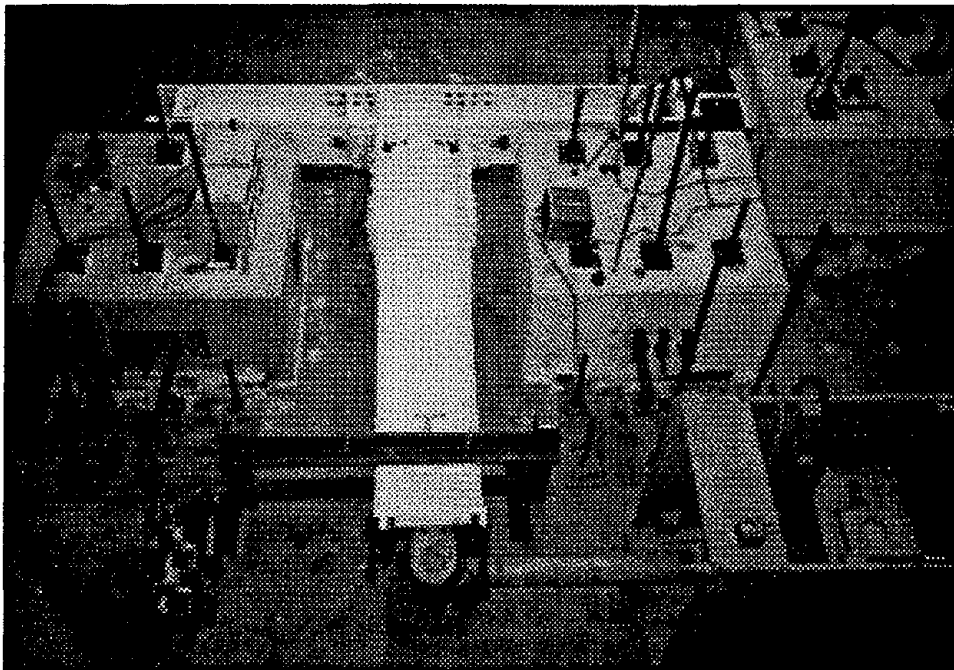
Photograph showing specimen tested horizontally in laboratory. Left side of the beam is the *upper* side of the specimen.
